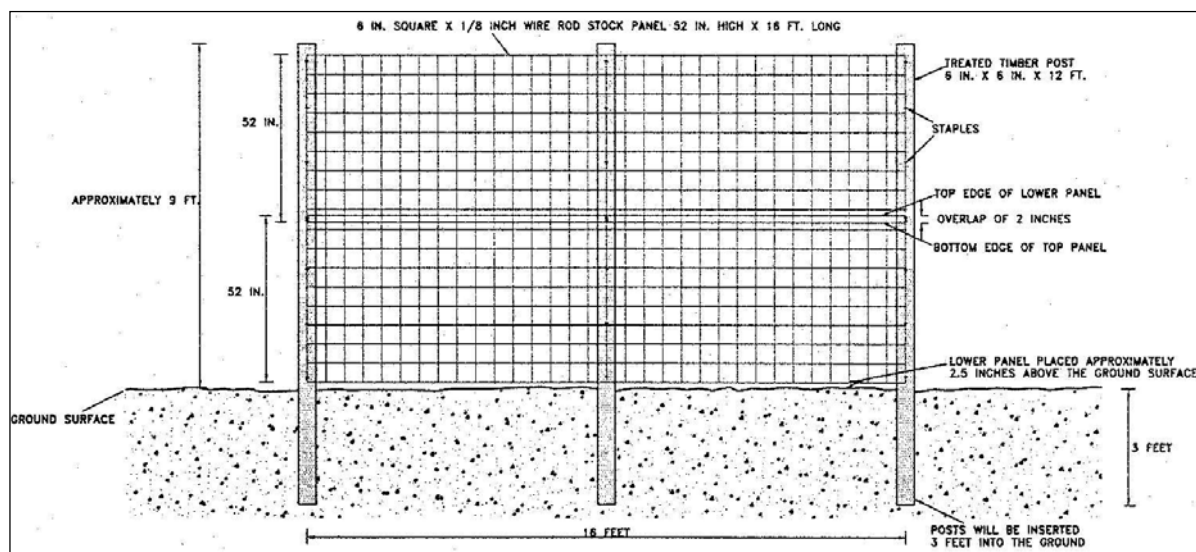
Wildlife exclosure details, cross-section view, for construction in Phases I – IV on the RRRWMA, Lower Red River Meadow Restoration Project (adapted from RME, 1997).
